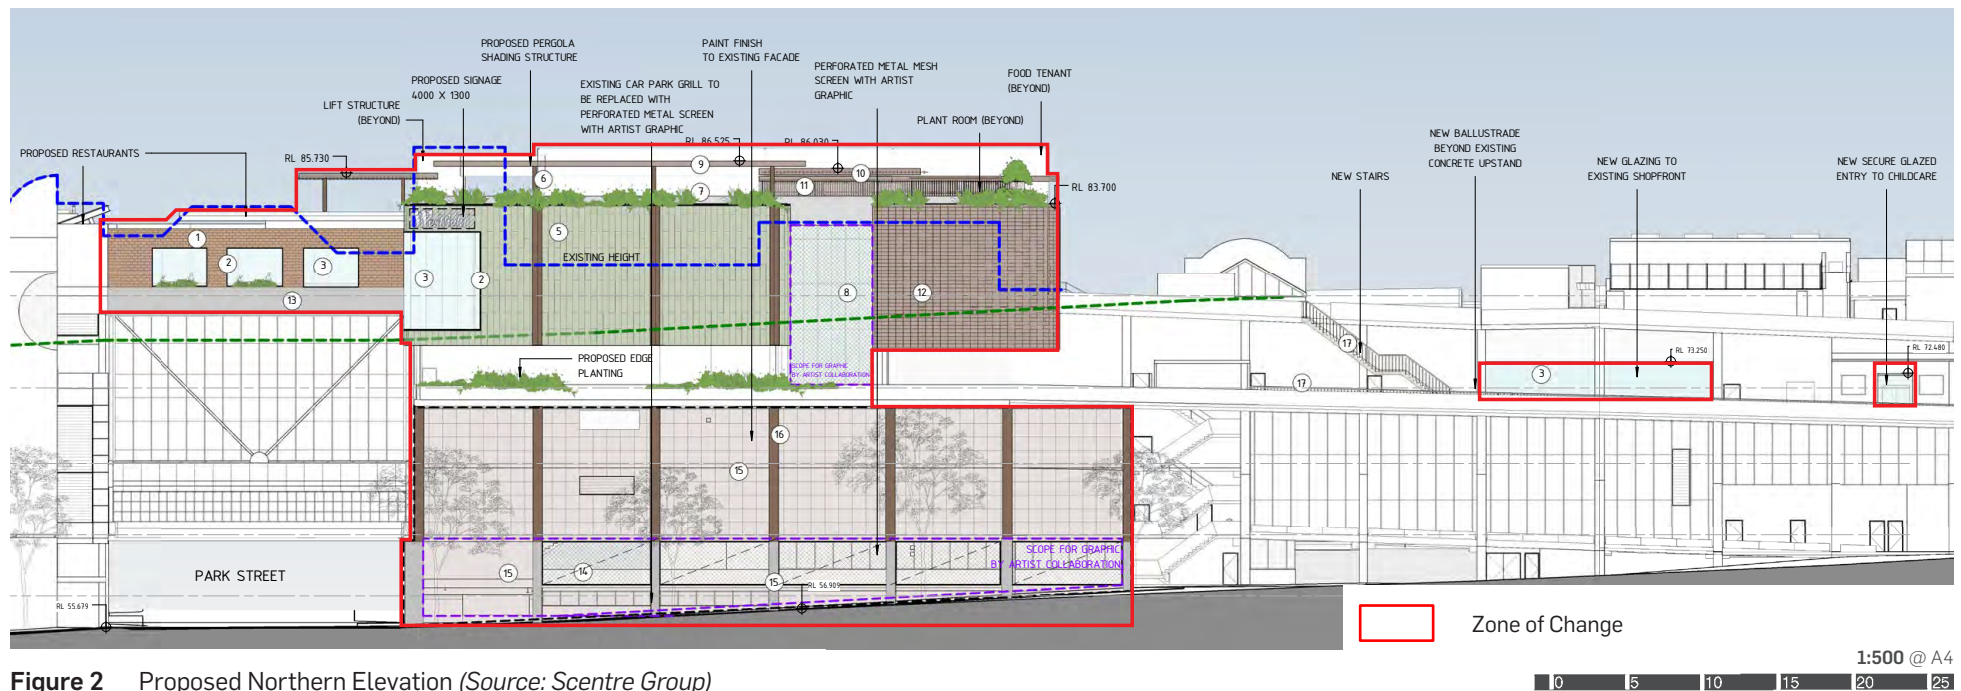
Proposed Northern Elevation (Source: Scentre Group)
